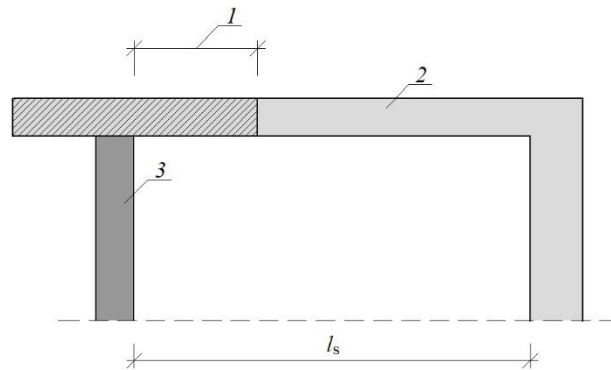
Flange widths that can be assumed for shear walls: 1 – a fragment of the intersecting wall, 2 – intersecting wall, 3 – shear wall,  $l_s$  – the distance between shear walls
